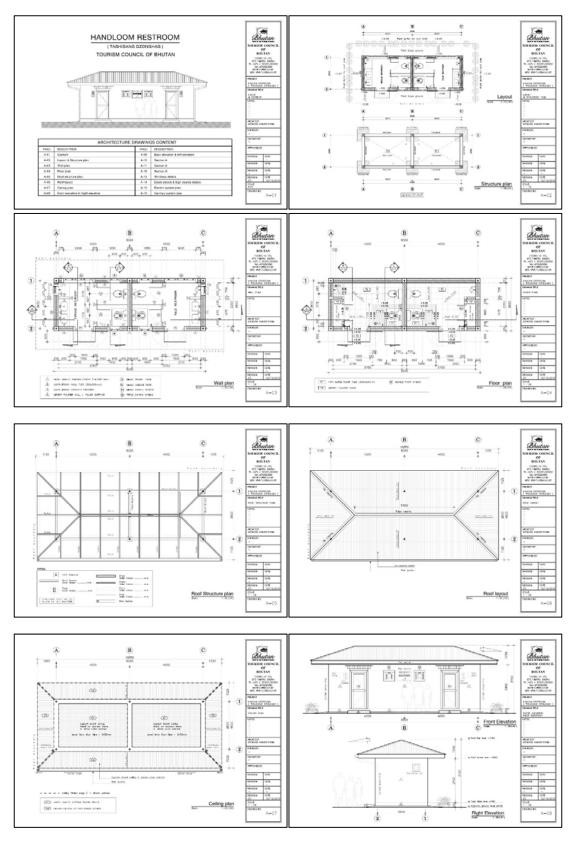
Construction drawings of Handloom center restrooms
